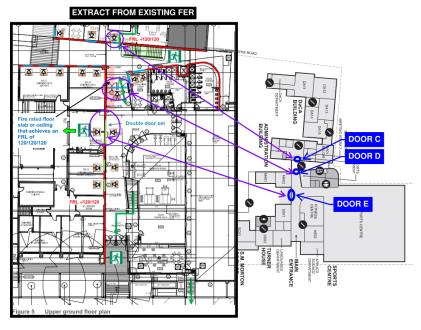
Extract from Existing Defire FER showing Door C, D and E – Ground Floor
